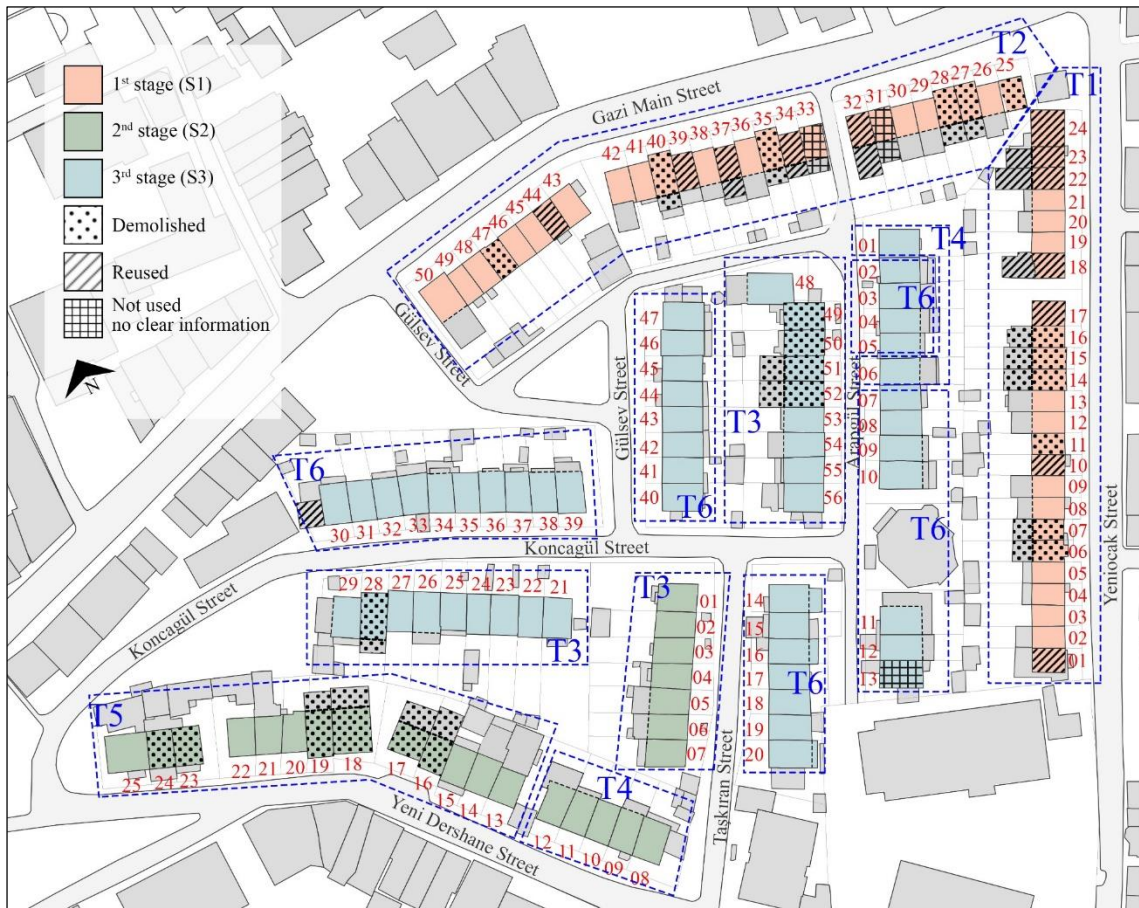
Layout plan (According to site visit in 2021. The original parts of the buildings are coloured, additions to them are given in grey colour - Adapted from plan taken from Uskudar Municipality Directorate of Construction and Urban Planning Archive)
